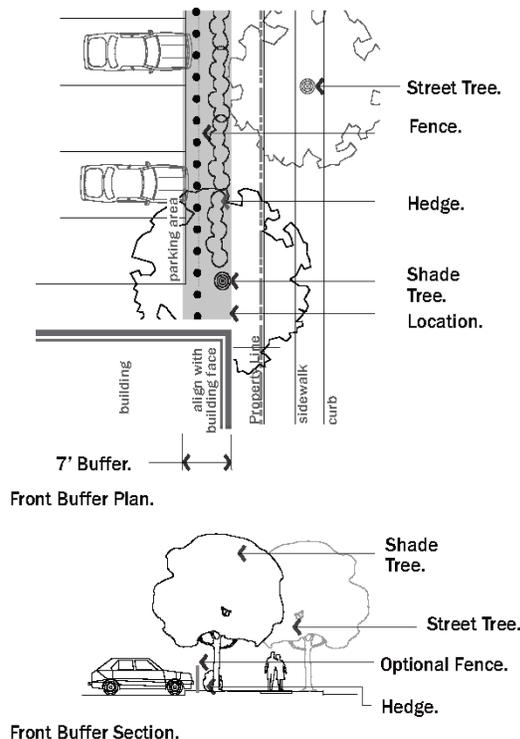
C (1). Frontage Buffer Plan and Section.
